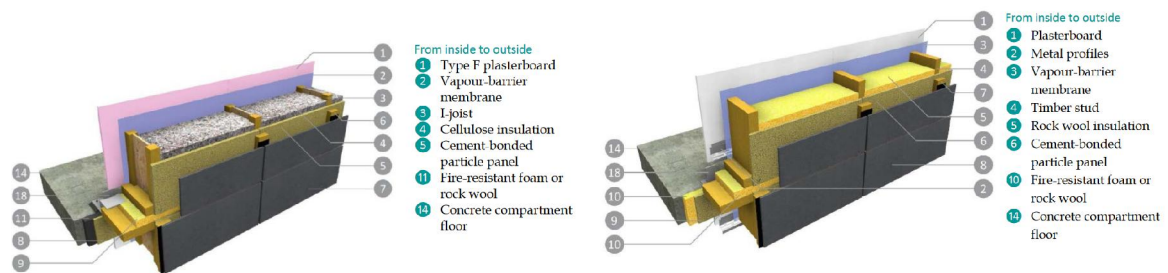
Examples of details of timber façade E 60 and junction EI 60 with a concrete floor
